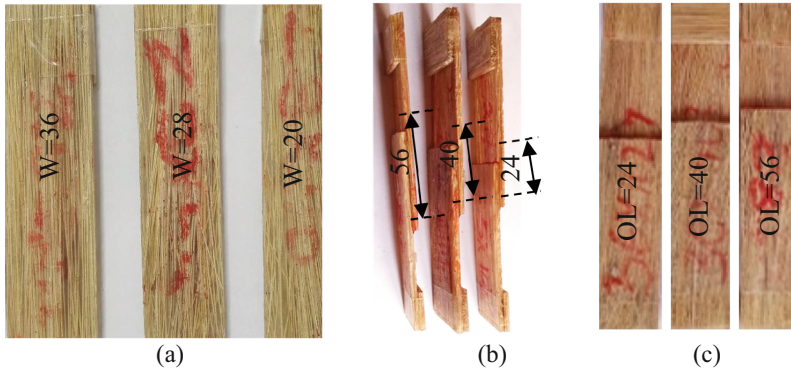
Adhesive joining: (a) width of specimen, (b) overlap length side view of specimen, and (c) overlap length side view of the specimen
